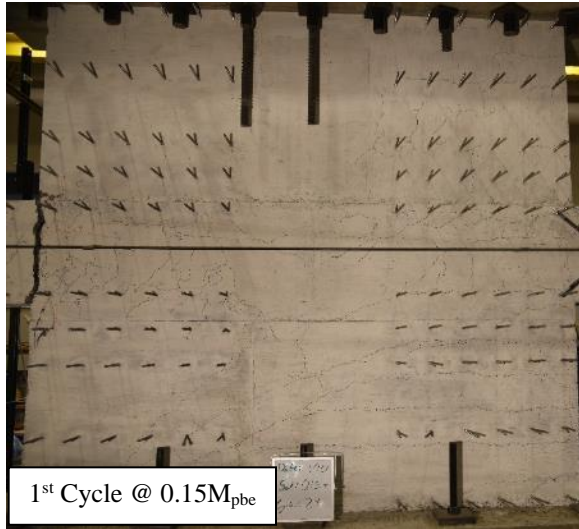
Wall Damage Photos for SRC-W4
